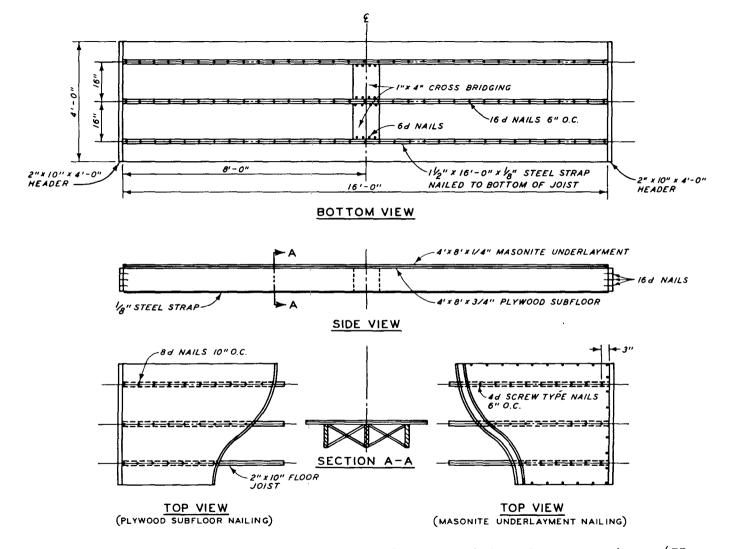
Construction drawing for the steel strap reinforced test specimens (II, VI, and IX).
